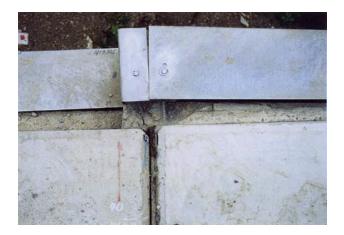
‡ ‡ ‡ Execution failure of movable joint part of EPS anchor
